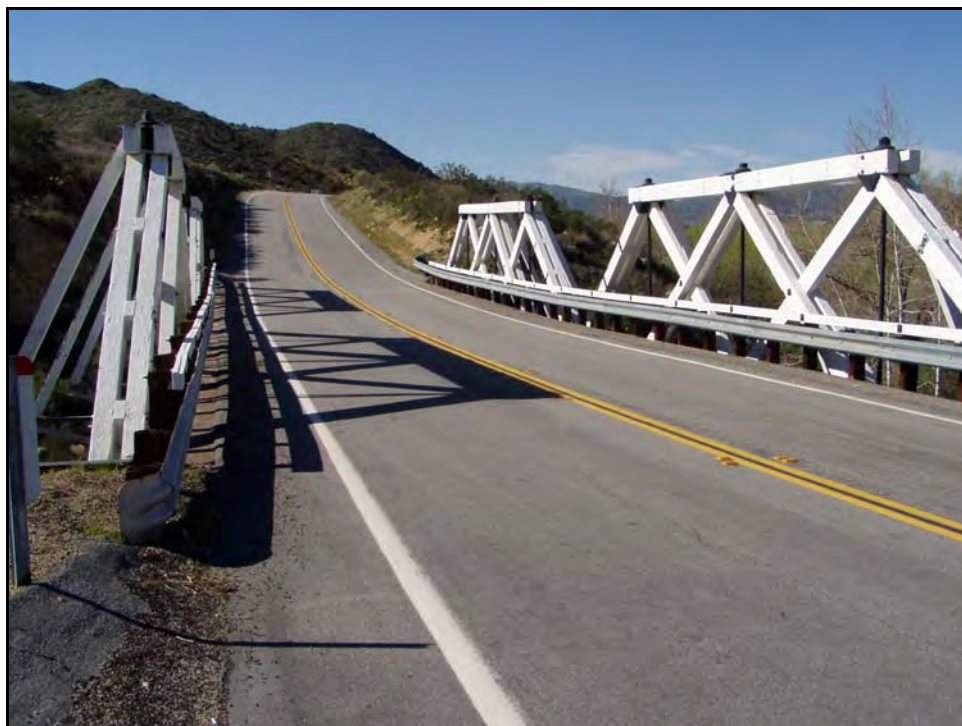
Cayucos Creek Bridge (49C0248). A-Frame truss built in 1940.
